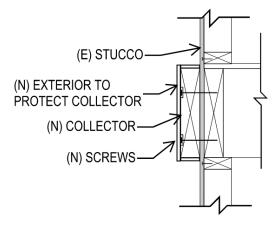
An alternative detail to stucco demolition that uses a new collector.
